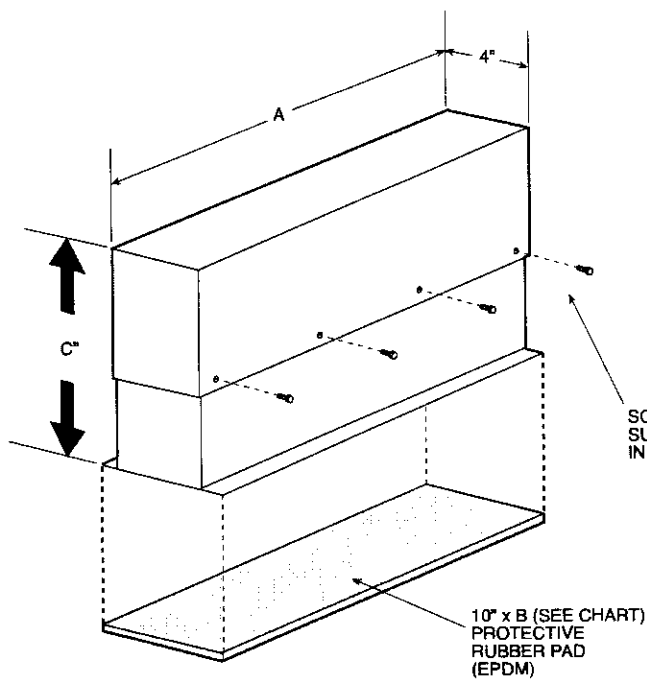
B — Roof Curb Details (48/50HJ008-014 Section Only)
